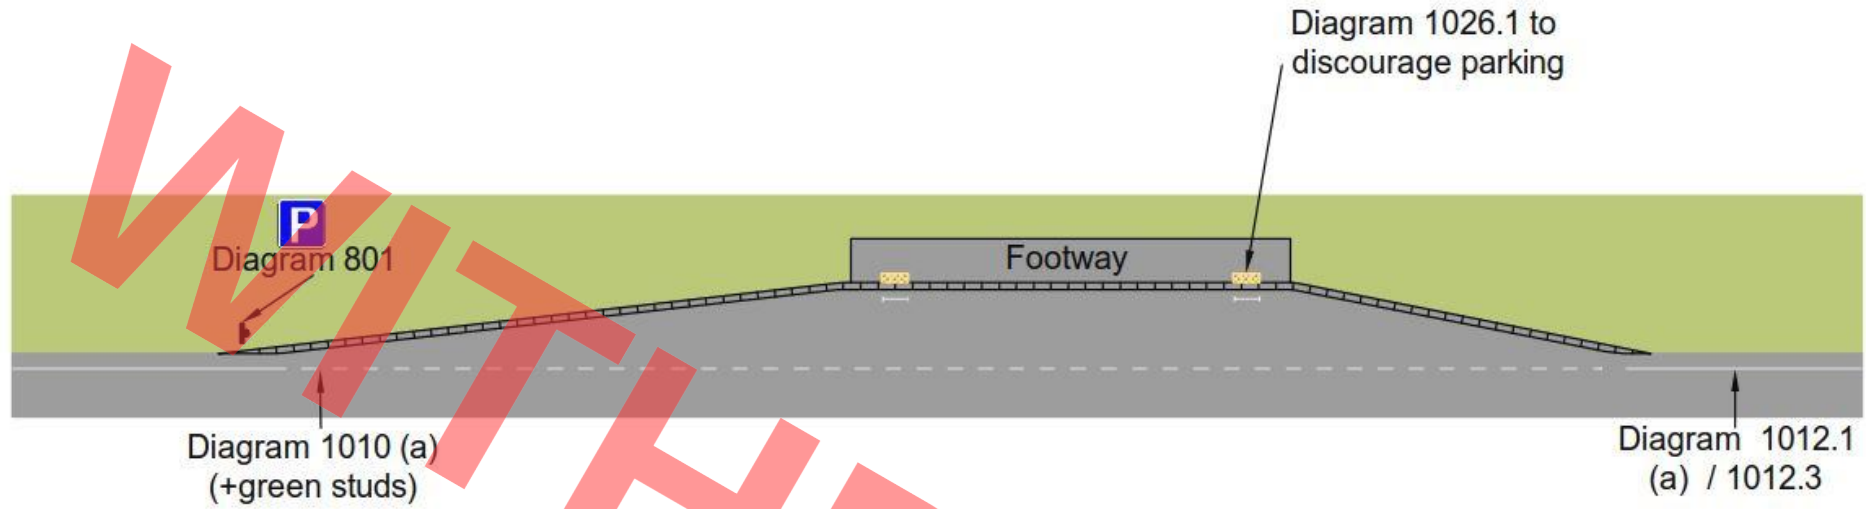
N2c Traffic signs and road markings for a type B parking lay-by
